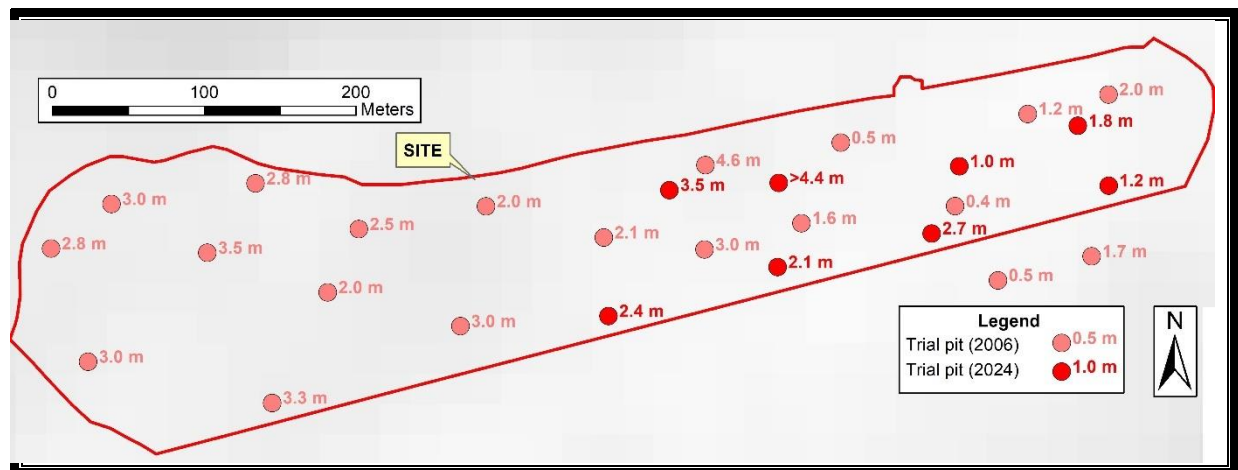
Point depths to bedrock at trial pit localities excavated across the proposed LRD Site area.
